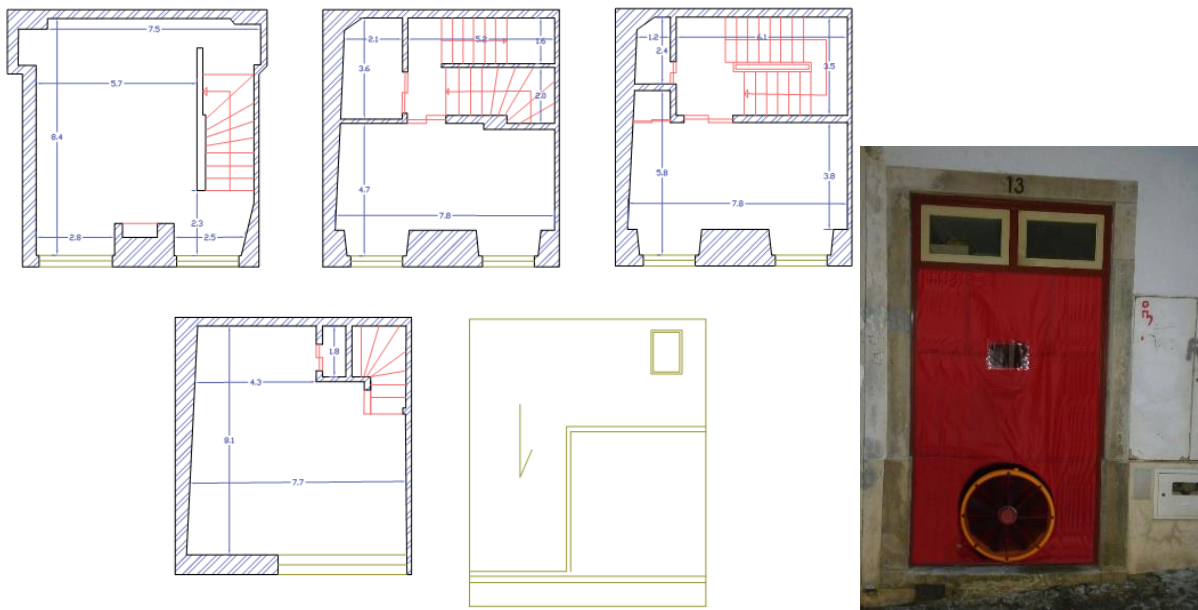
The ground floor plan and figure for the tested building- Case study 4
